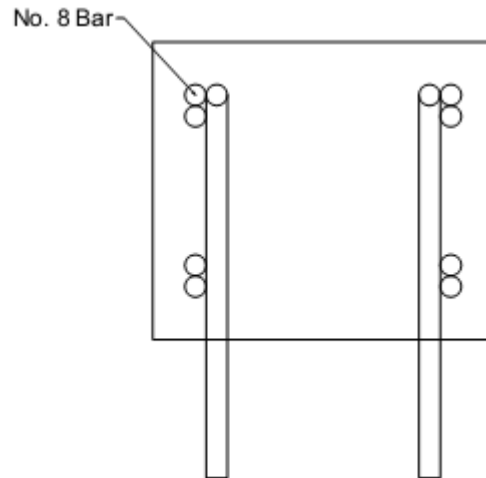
Longitudinal column reinforcement-8 No. 8 bars (four bundles of two bars each). Transverse reinforcement not shown.
